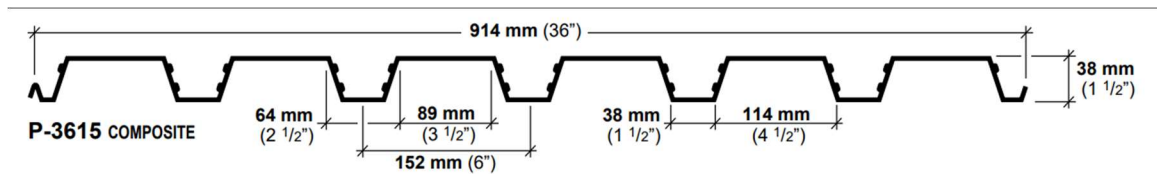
Example of a trapezoidal decking profile (Canam, 2010).
